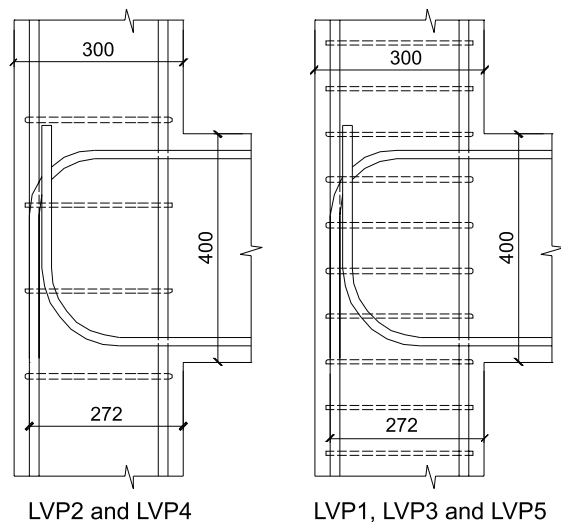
Reinforcement details of the beam-column joints (dimensions in mm)
